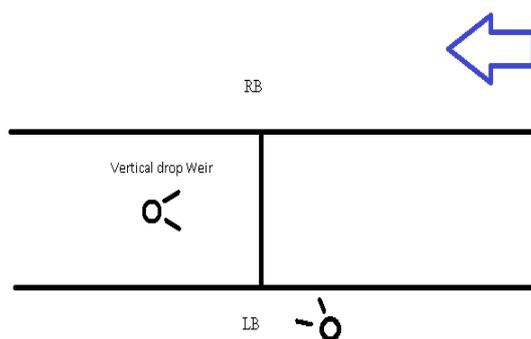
Site plan for Mereway Barrier 2
